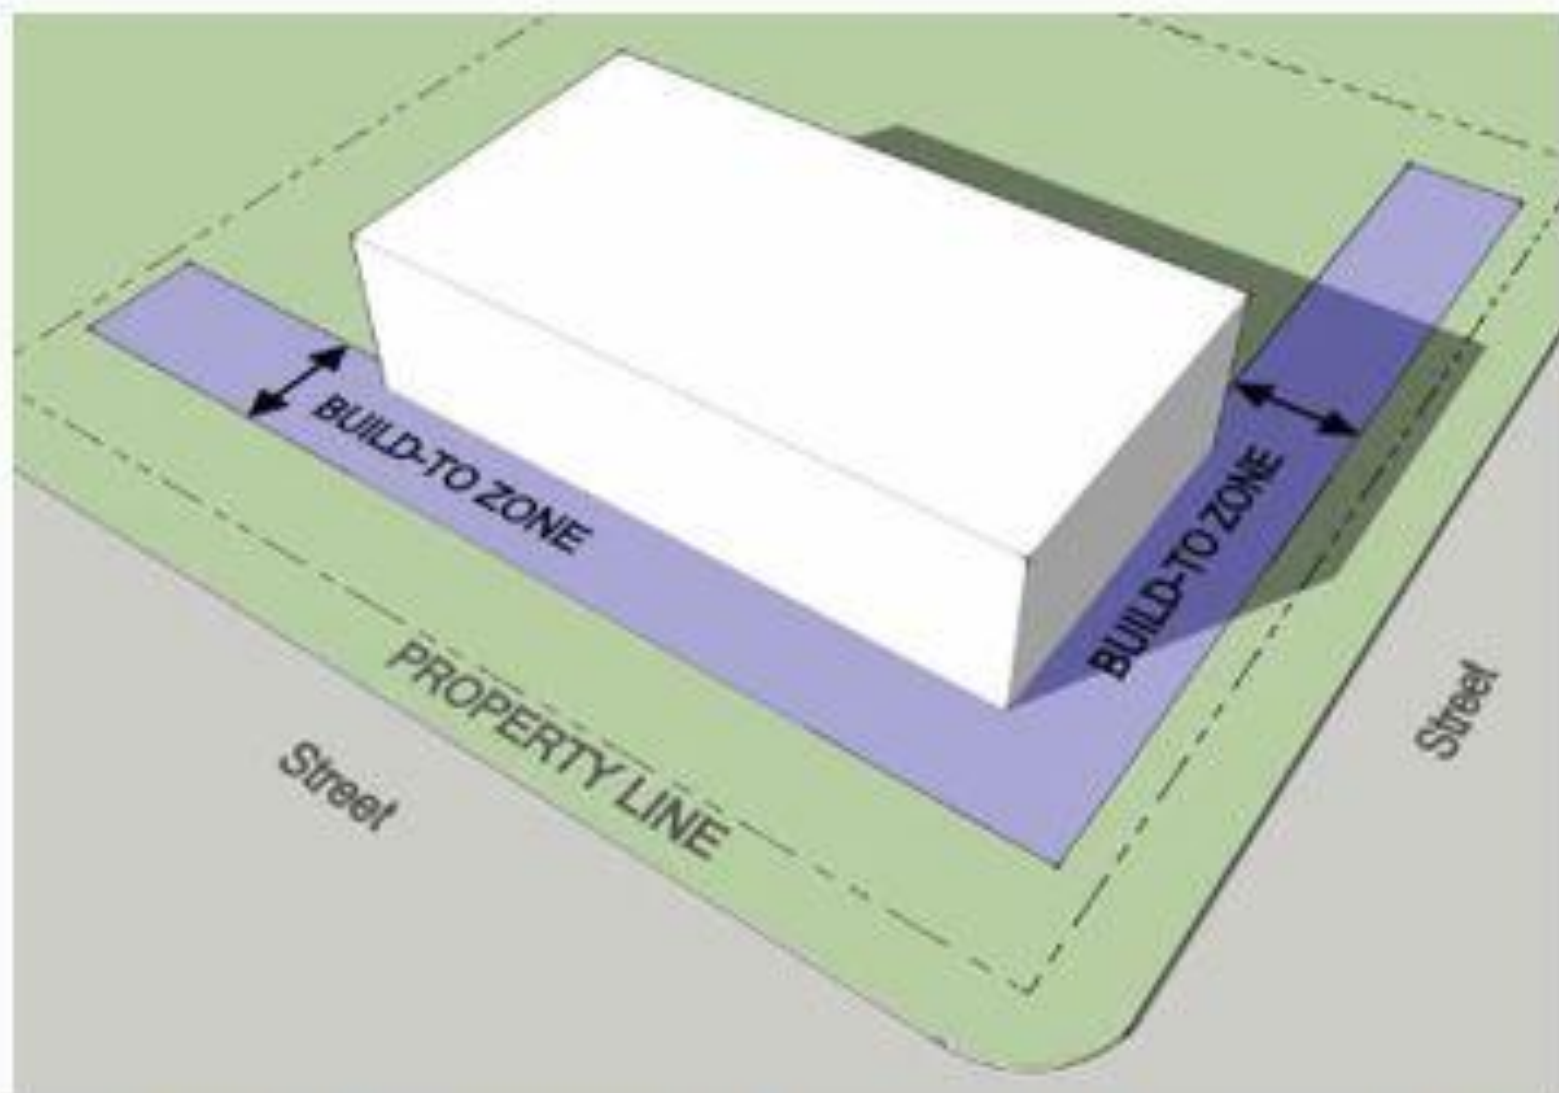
Build-To Zone. Both road frontage facades shall be placed within the build-to zone, which has a minimum and maximum distance from the property line.
